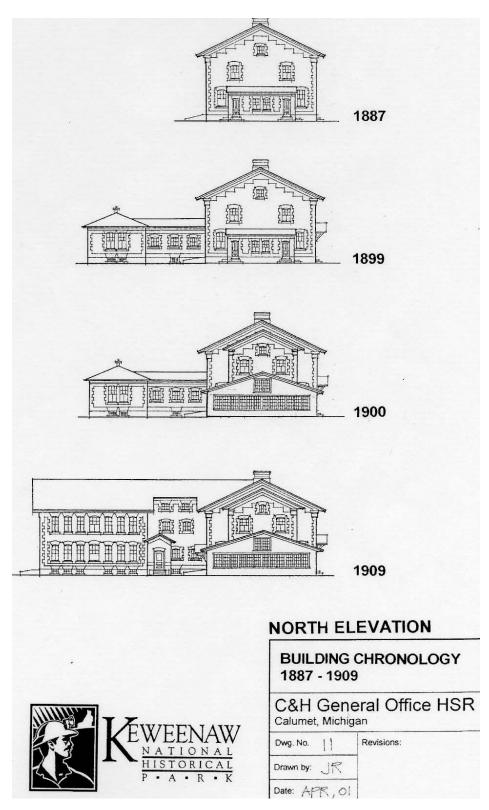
C&H office building chronology showing north elevation additions made from 1887 – 1909. This elevation well documents the additions made to the east elevation throughout time. Image courtesy of Keweenaw National Historical Park, Calumet & Hecla General Office Draft Historic Structure Report.
